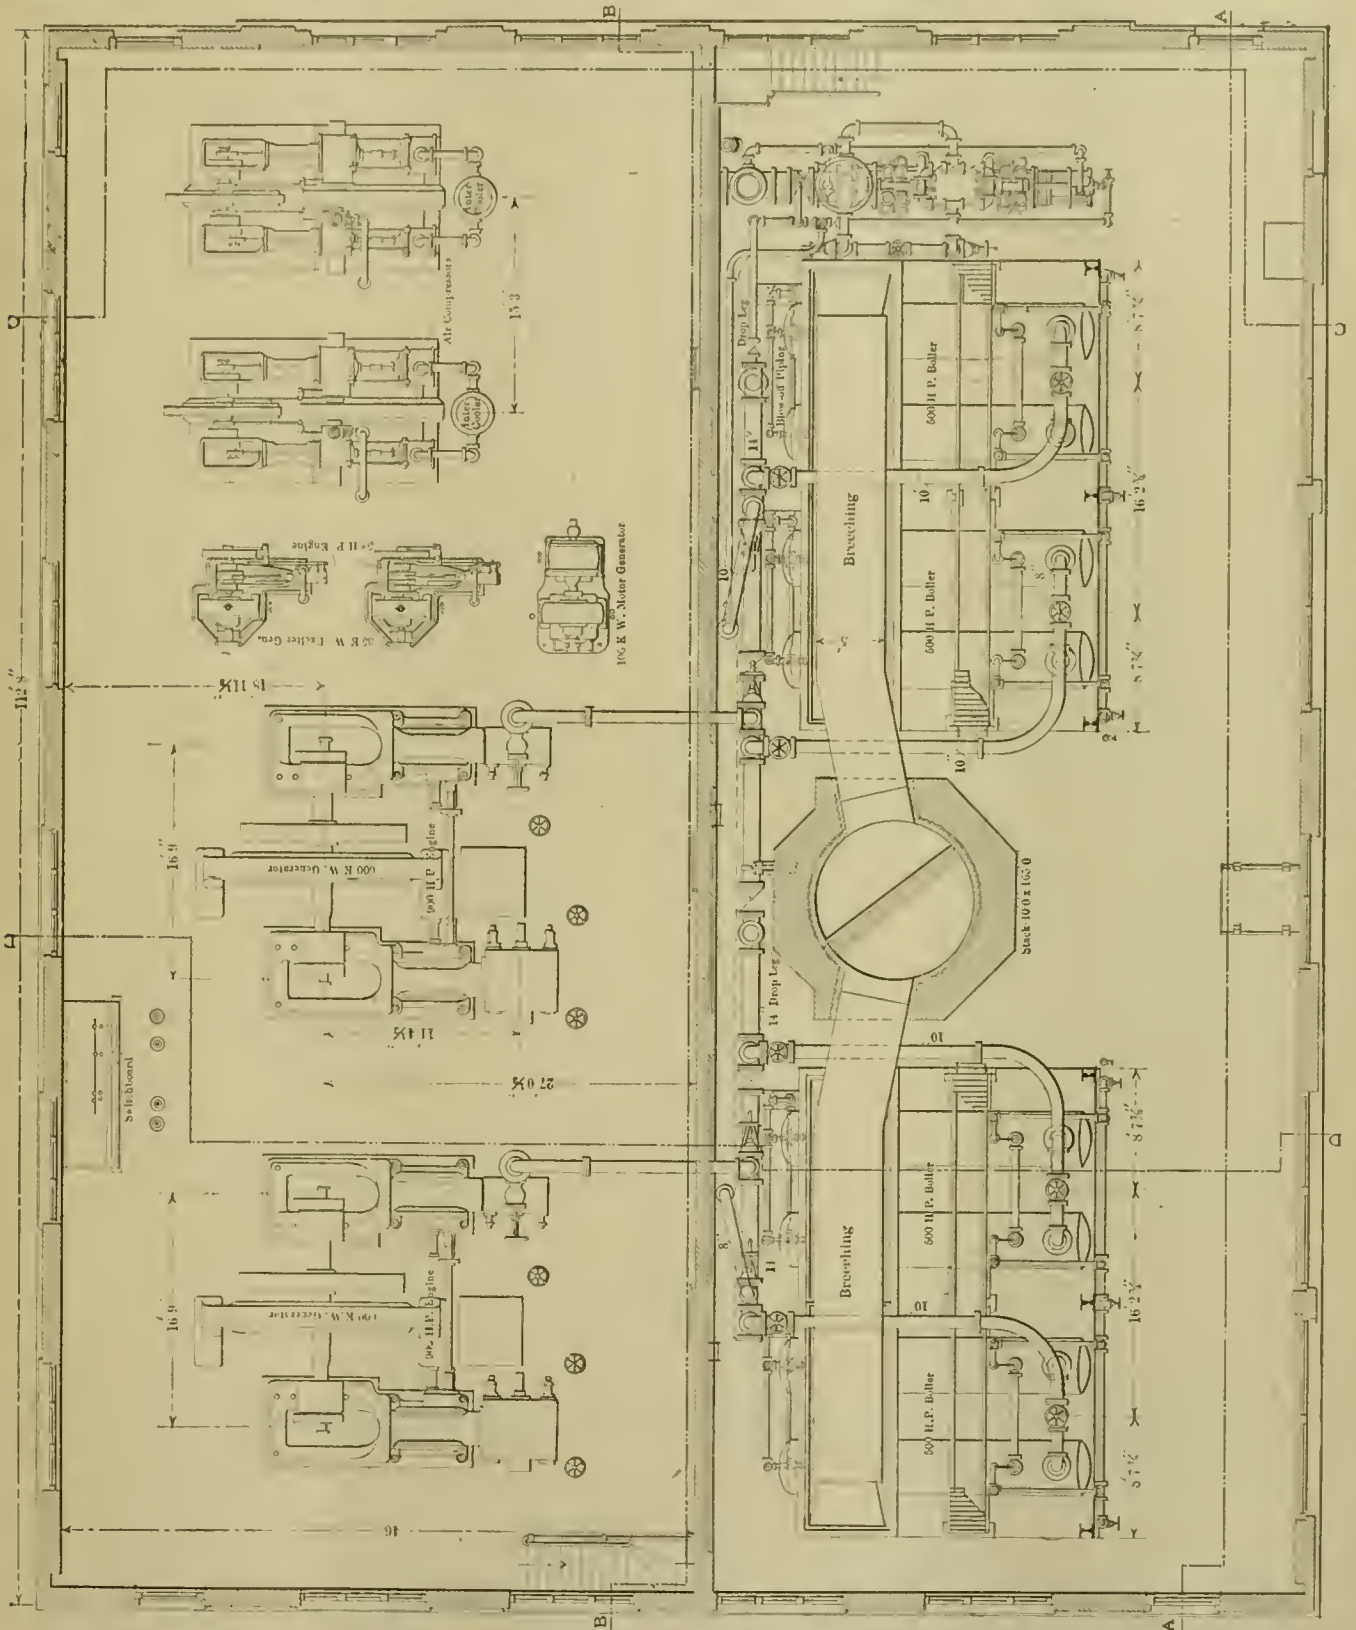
PLAN OF MAIN OPERATING FLOOR OF BOILER AND ENGINE ROOMS, WEST ALBANY POWER HOUSE—NEW YORK CENTRAL RAILROAD.
